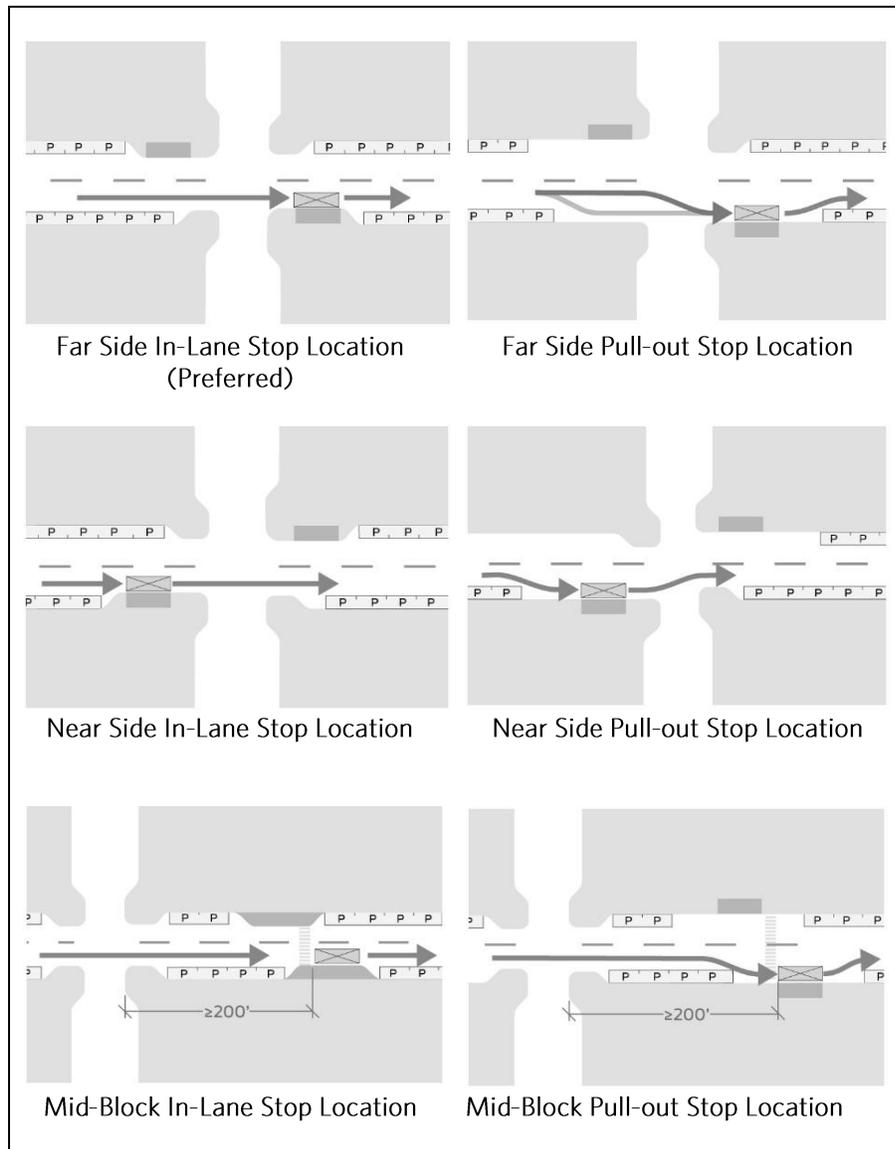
STOP LOCATION RECOMMENDATIONS
